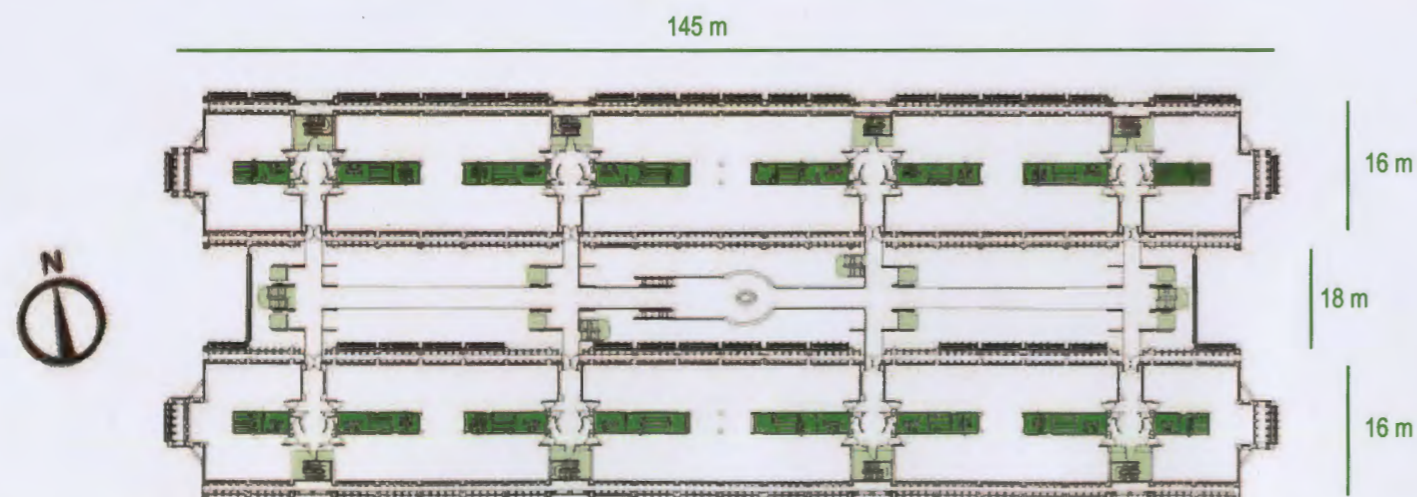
typical floor plan of Eastgate centre by Michael Pearce
